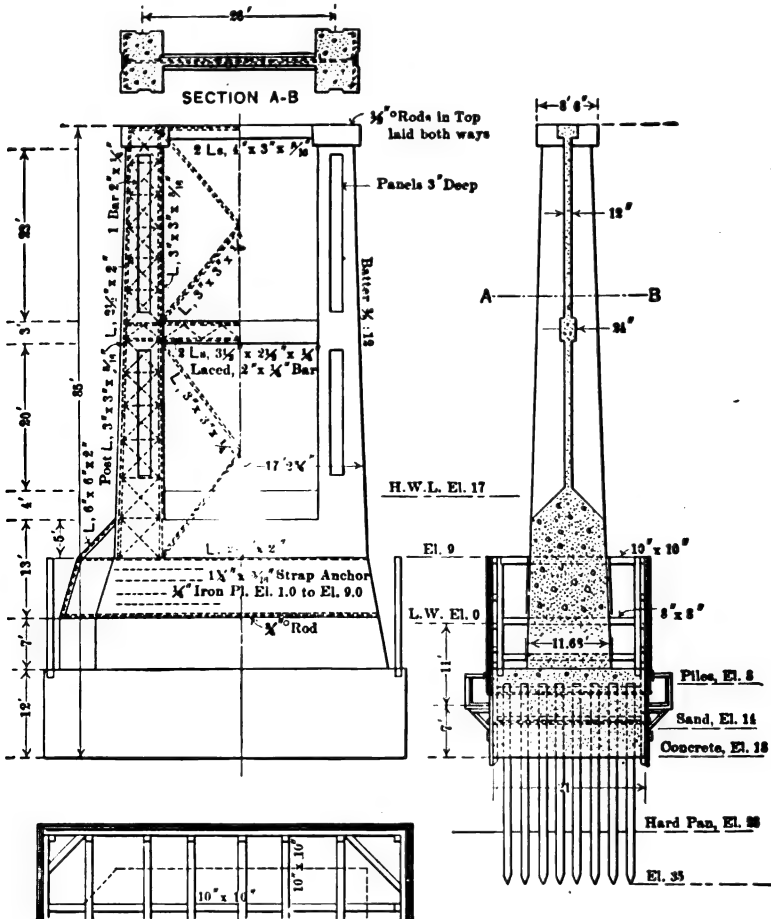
PIER OF BURLINGTON BRIDGE.
